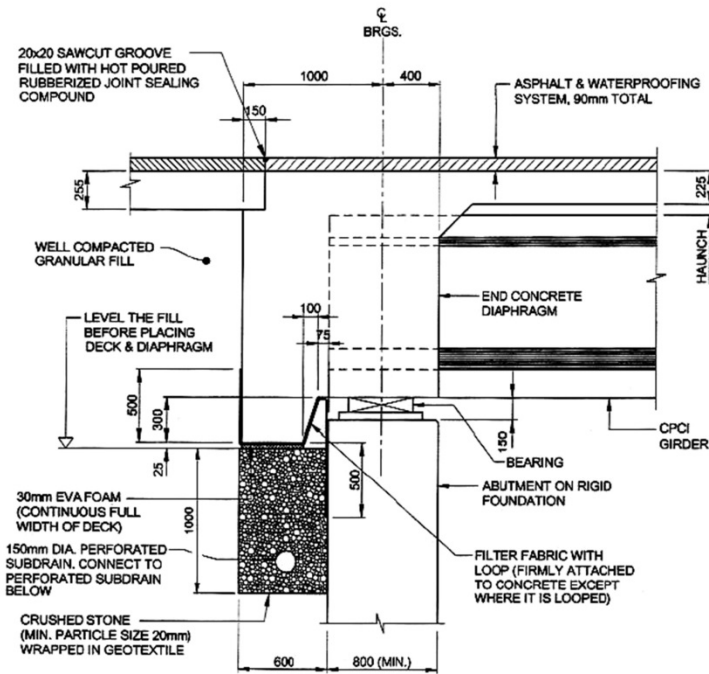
Semi-integral abutment configuration: CPCI girder with concrete deck and end diaphragm (expansion length greater than 50m) (Husain, 2004)
